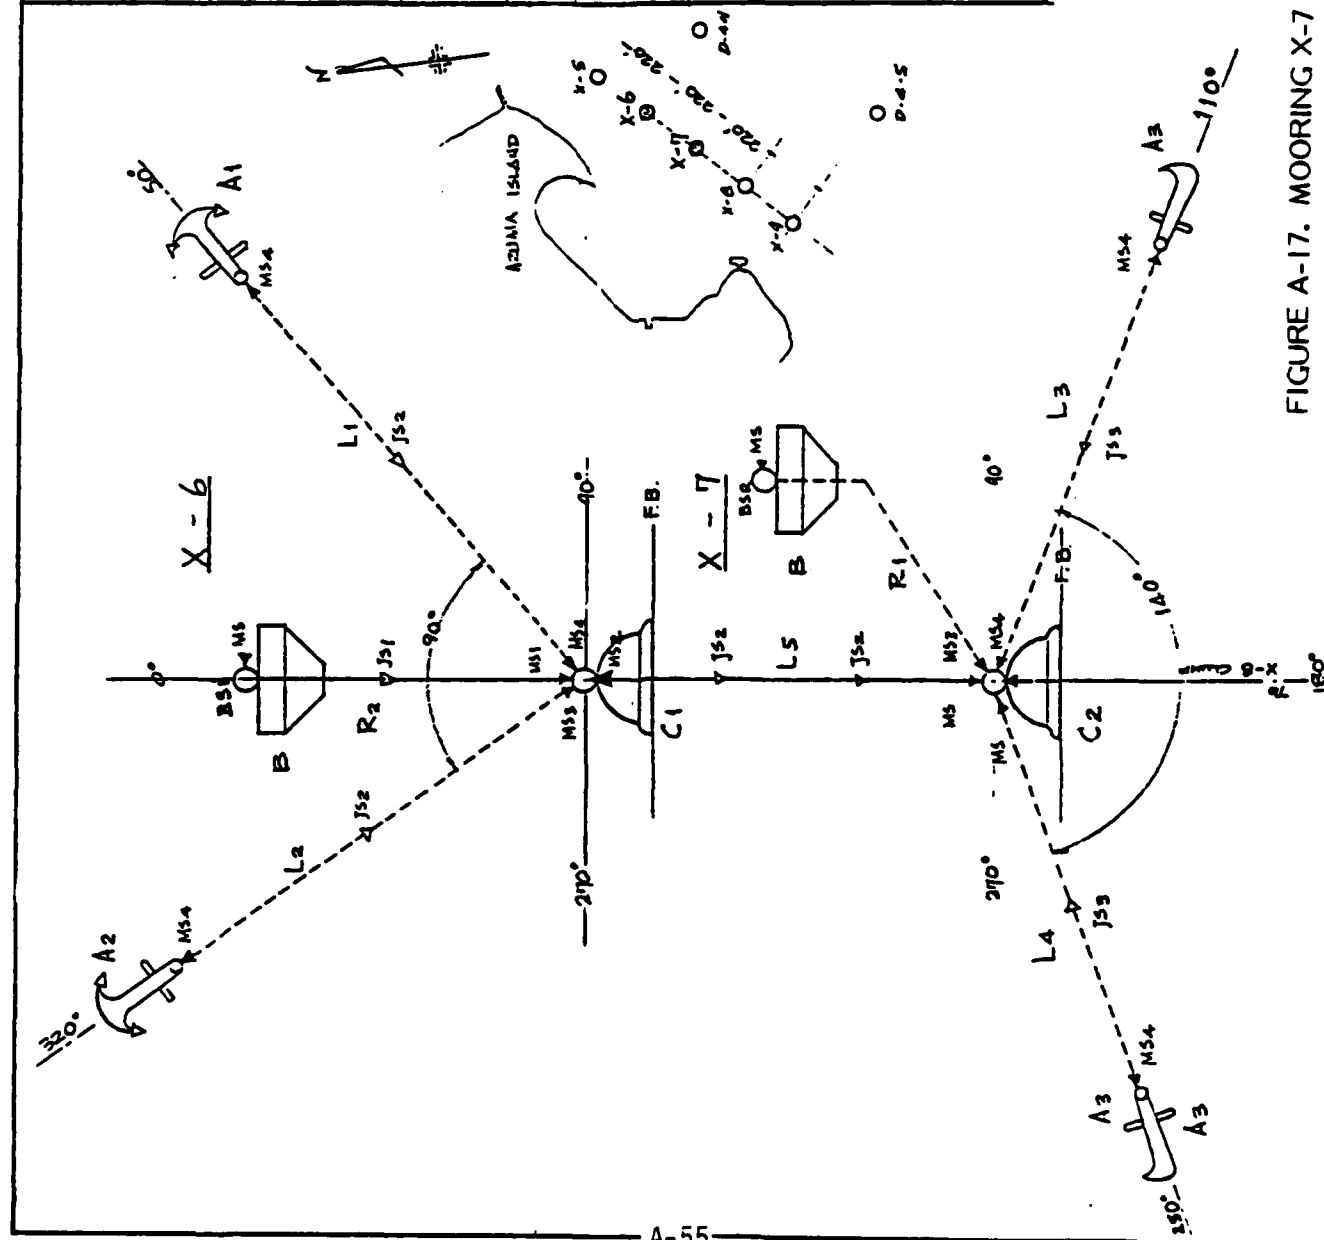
MOORING X-7 SCHEMATIC DRAWING
